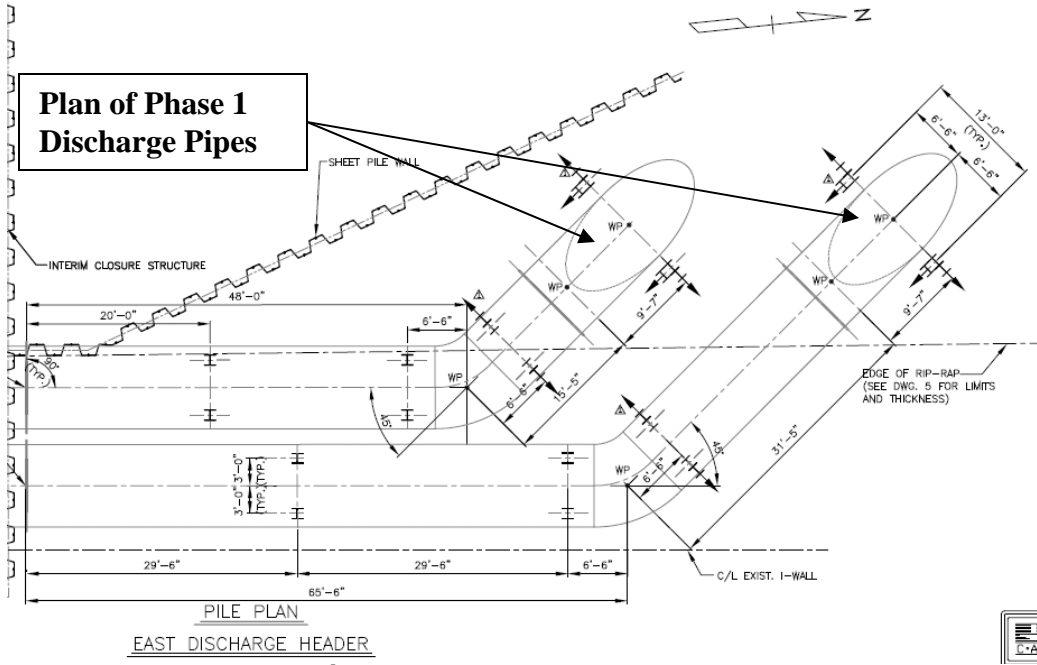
17th Street Discharge Pipe Layout East Bank
